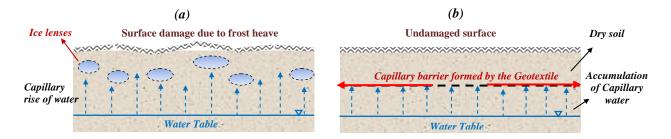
Advantage of the enhanced lateral drainage mechanism in mitigation of damages caused by frost-heave deterioration: a) without the wicking fabric geotextile; b) with the wicking fabric geotextile
